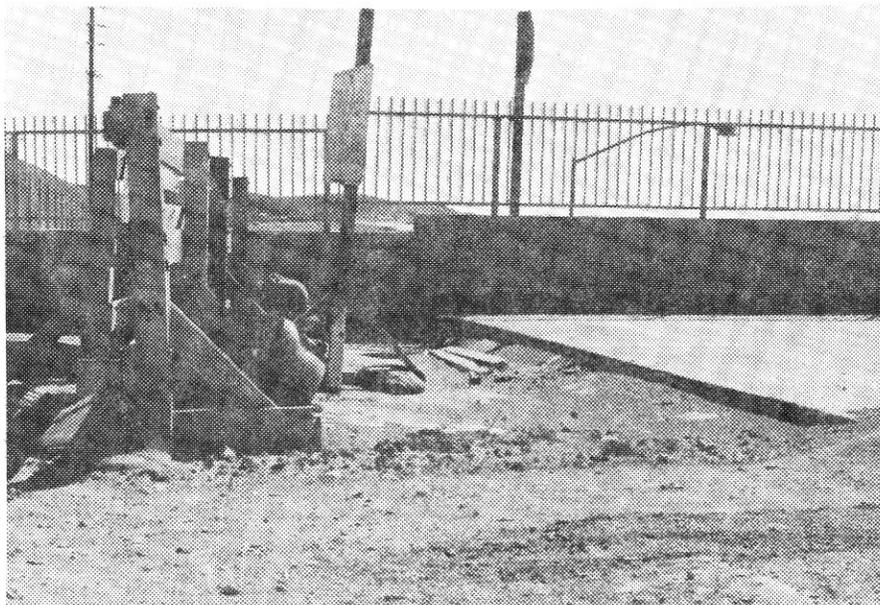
Approach and wingwall settlement at easterly end of Balboa Boulevard Overcrossing.
